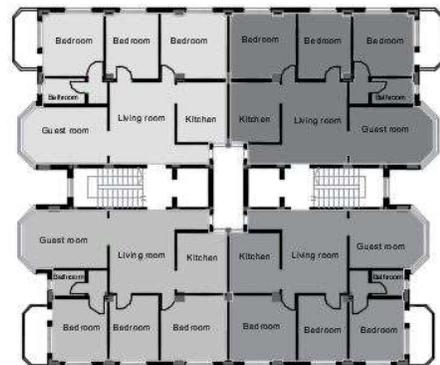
Multi-story residential building plan: each floor consists of four apartments – source: researcher
